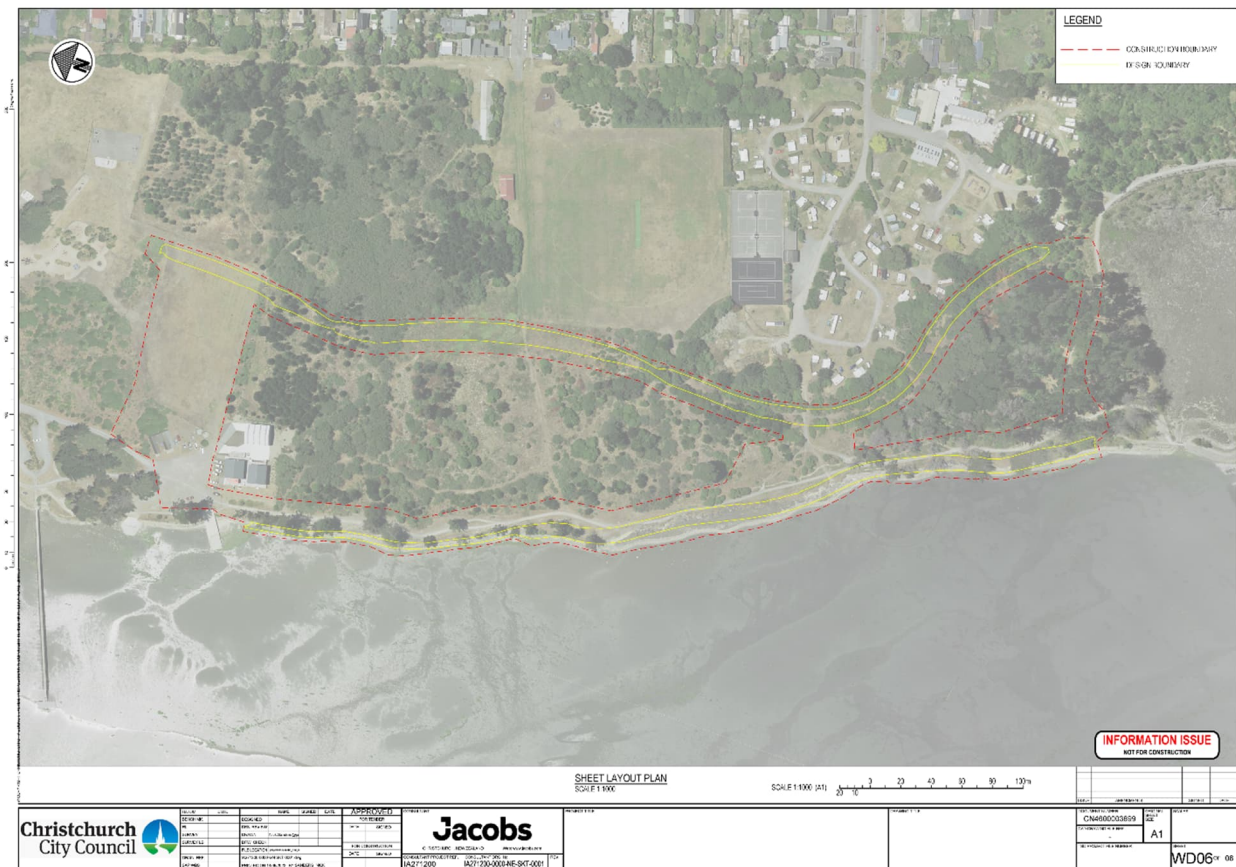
Aerial image of South New Brighton Park showing the project extent.
